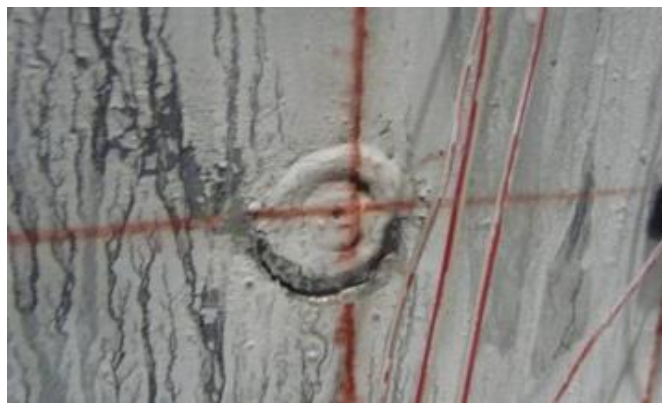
Half Diameter Crack of Inner Tie Bar Plug Welding of Specimen CFSSP-B1 at 2% Drift
